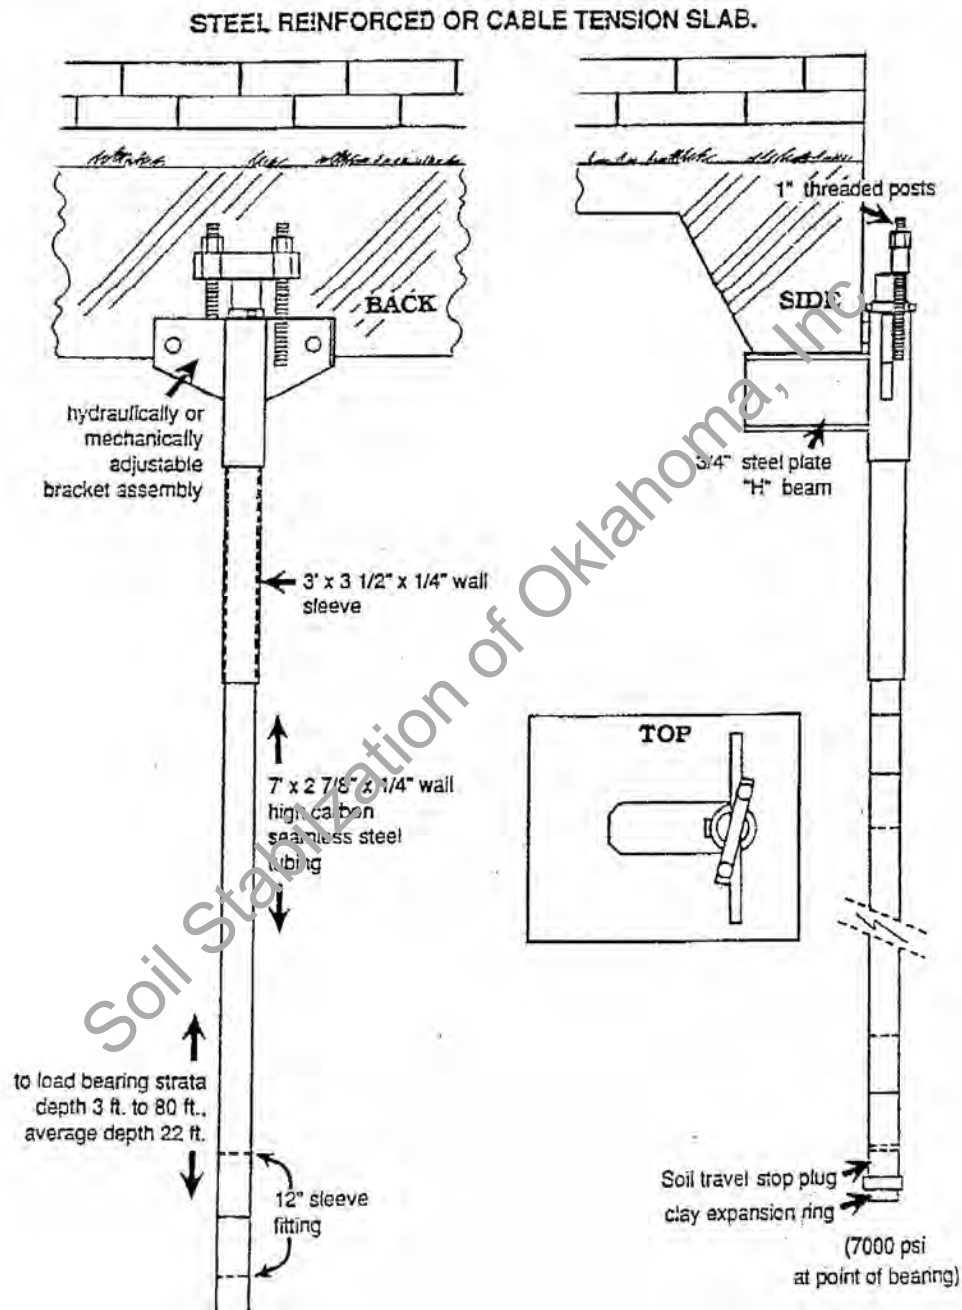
Typical Pressed Steel Piling Attachment to House
